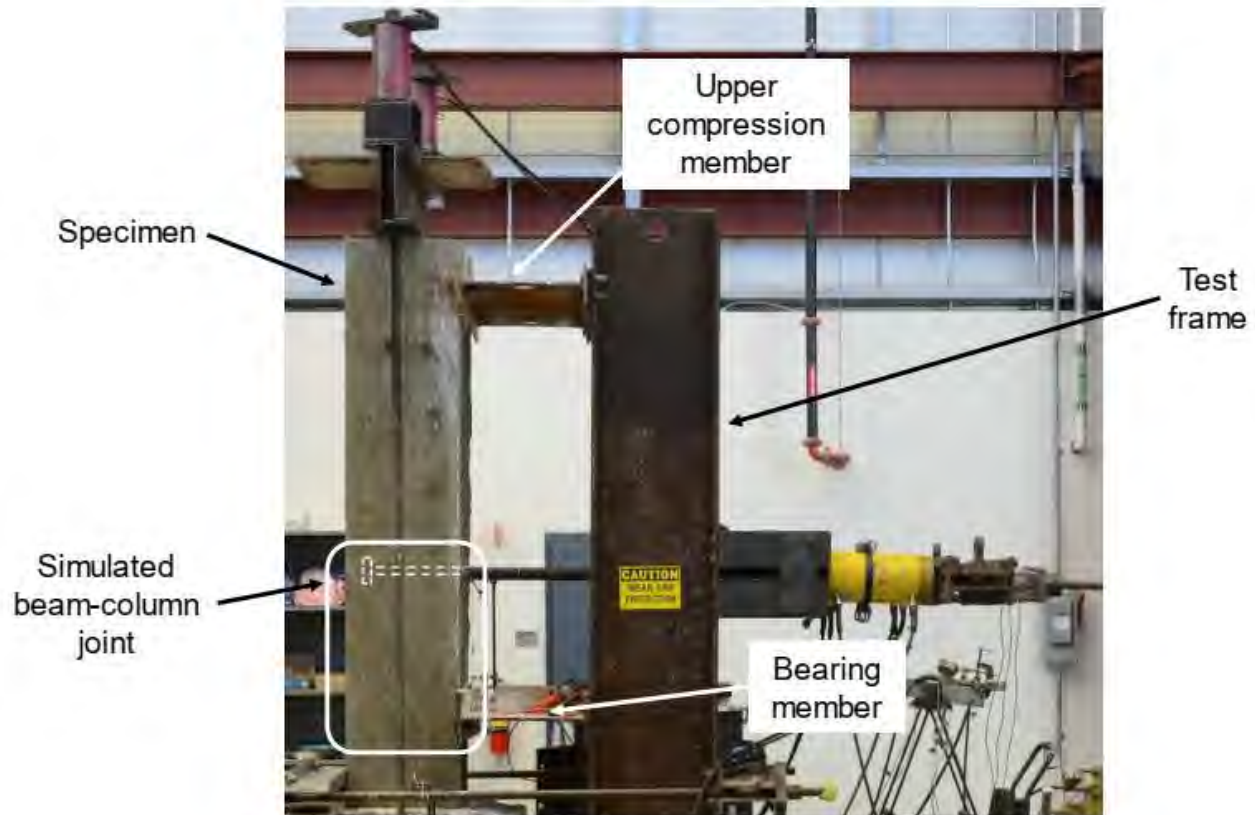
The loading frame and test setup of headed bar specimens (Shao et al. 2016)
